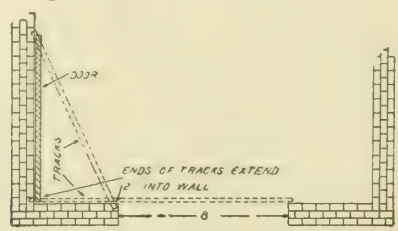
PLAN RIGHT-ANGLE SLIDING DOOR
